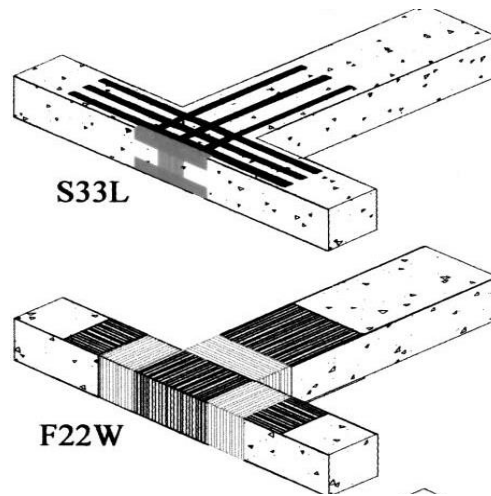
Layout of Mechanical Anchorages in Exterior Beam Column Joint (*Antonopoulos and Triantafillou, 2003*)
